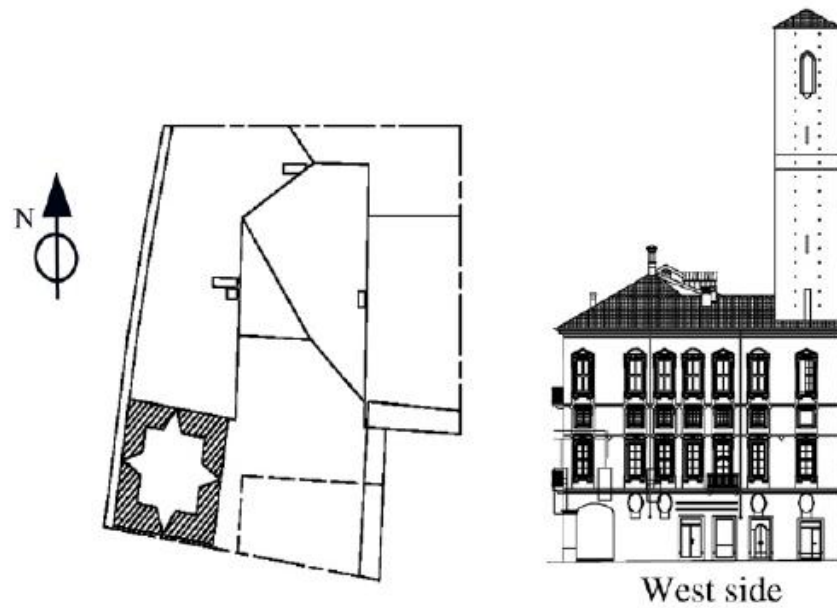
Torre Bonino. Plan and elevation view of the tower.
